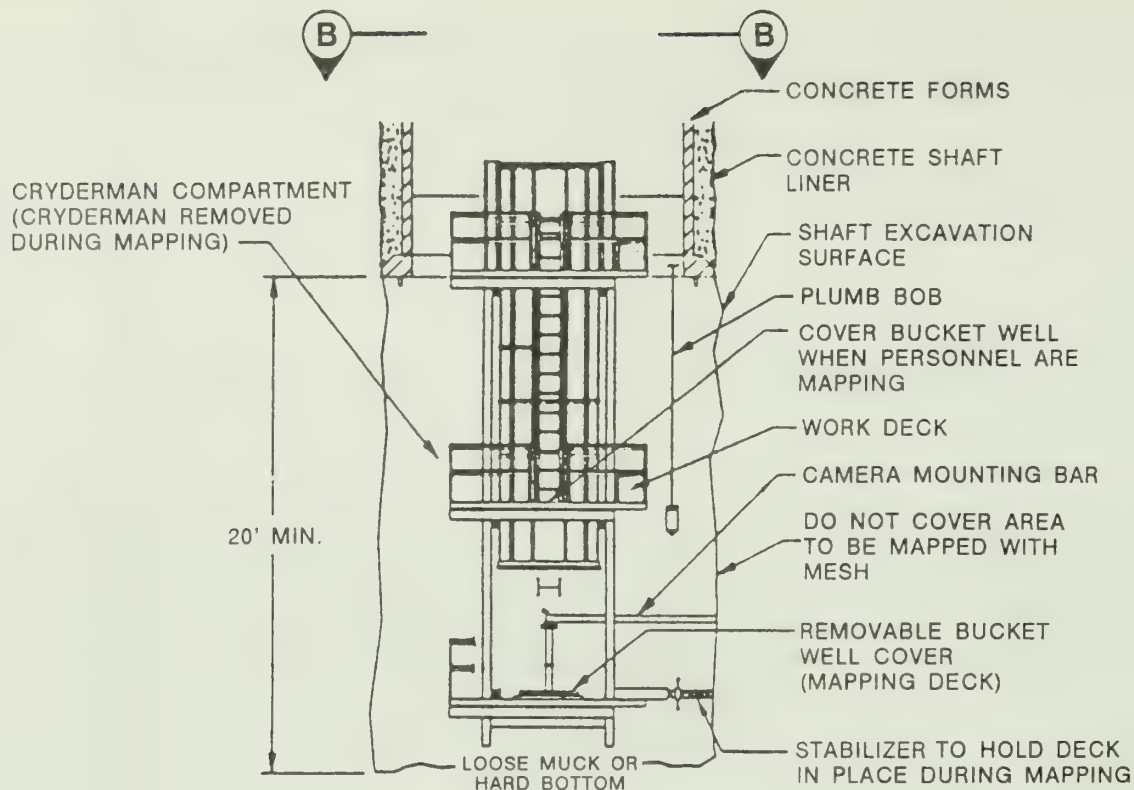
Exploratory shaft 1 section illustrating shaft stations Modified from Title I design package (DOE, 1988).
